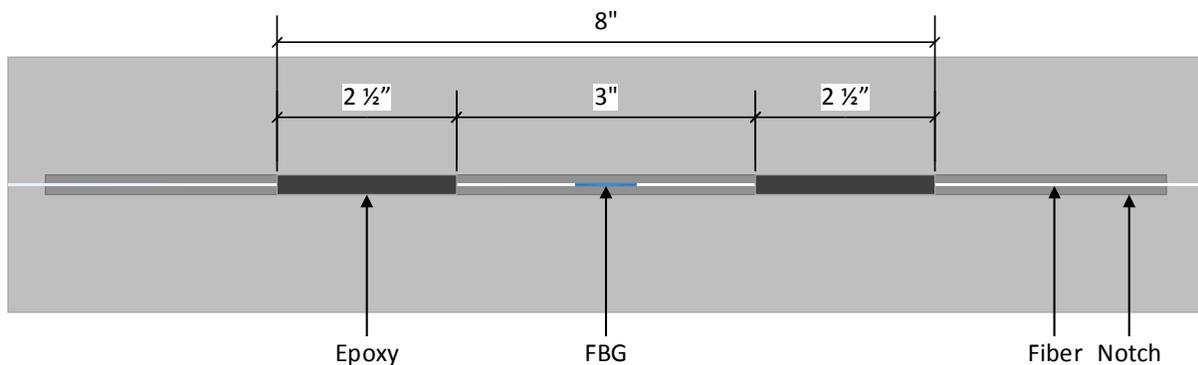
Minimum Configuration for Long-Gage Strain Sensing of Concrete Using an FBG
